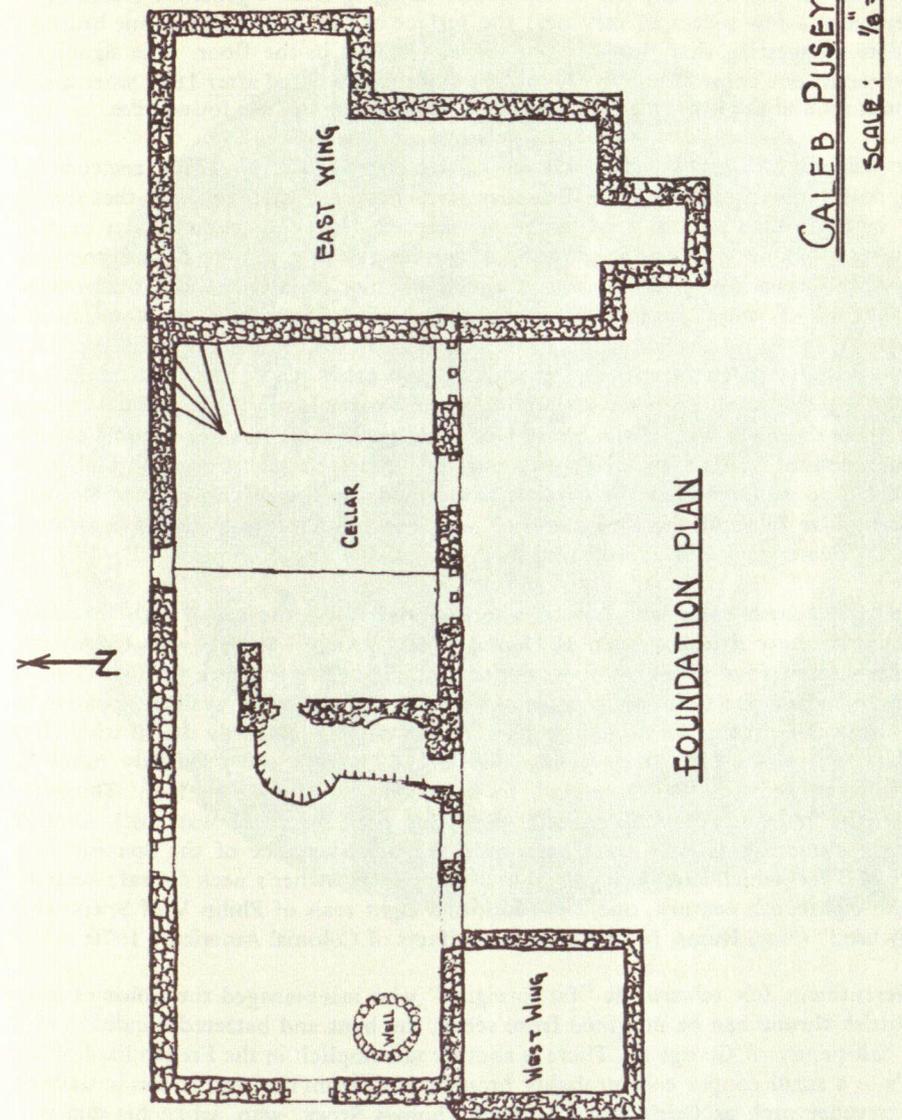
Caleb Pusey House Foundation Plan, as revealed by excavations. Sketch by George E. Jackson.
